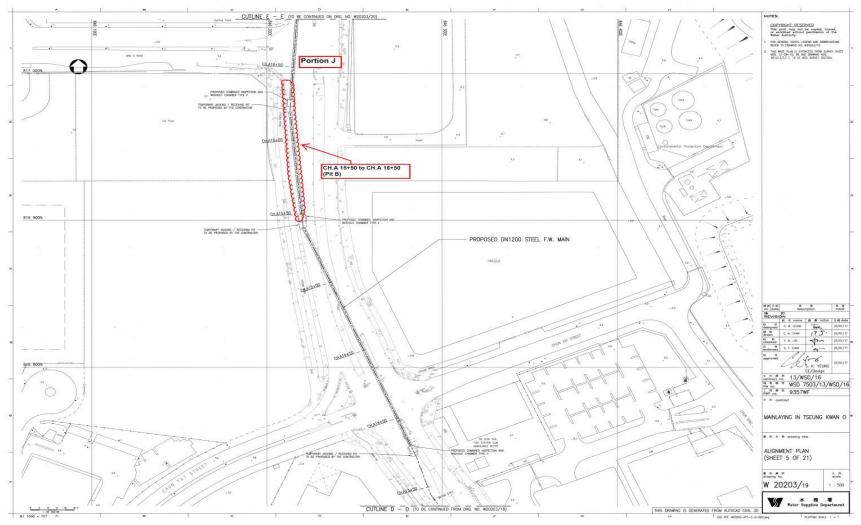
Location Plan for Portion J – CH. A15+50 to CH.A 16+50 (Pit B)
